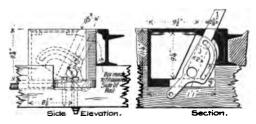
Stop Block for Street Railway Track at Grade Crossings.
